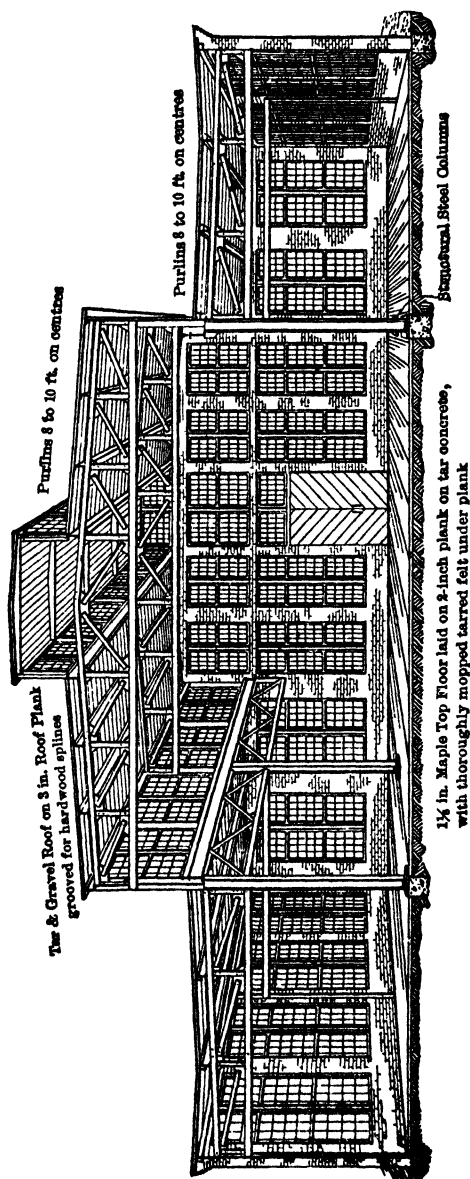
One-story Work-shop. Roof-boards on Purlins
